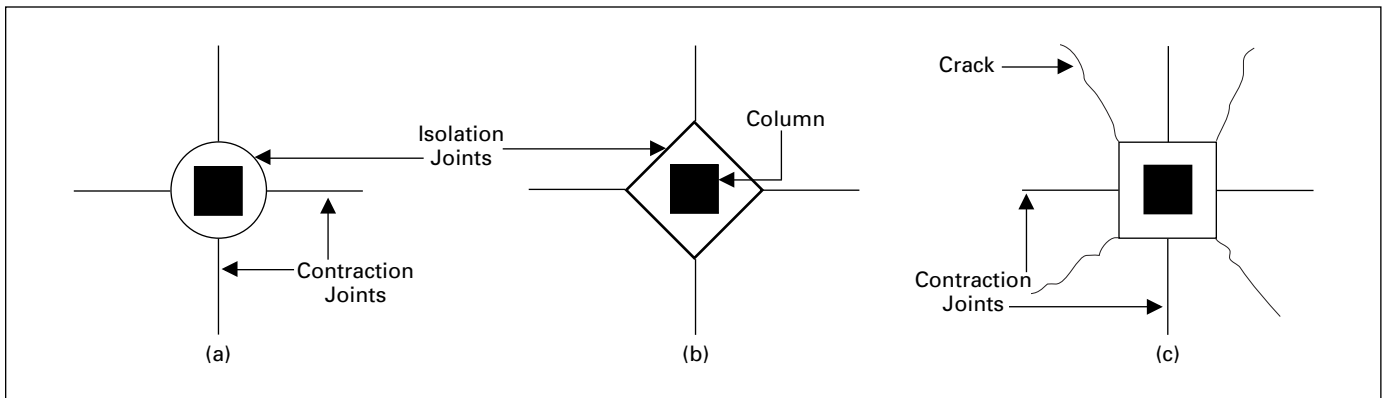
Isolation joints around columns can be circular (a) or square (b). If no isolation joints are used around columns or if the corners of the isolation joint do not meet contraction joints, radial cracking (c) can occur.
